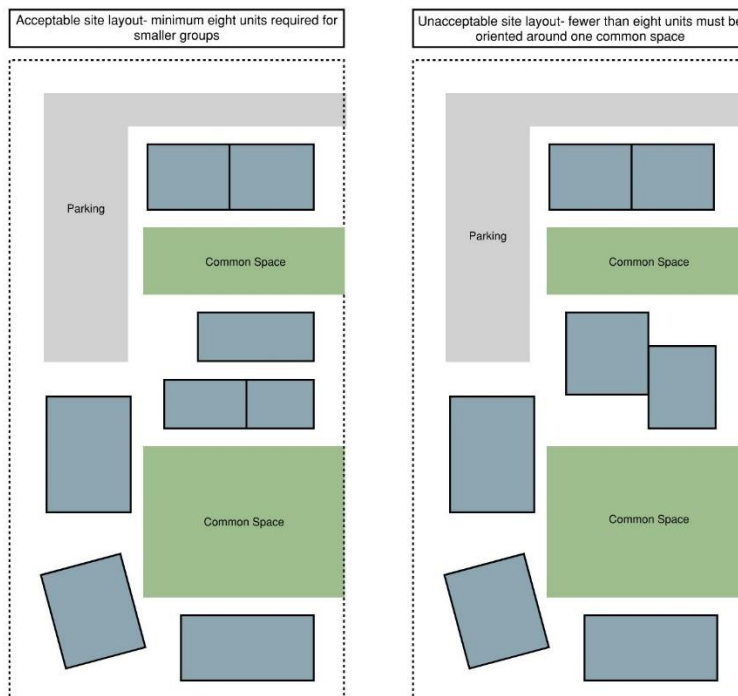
(C): Flexible Site Configuration with Multiple Common Open Space Areas
